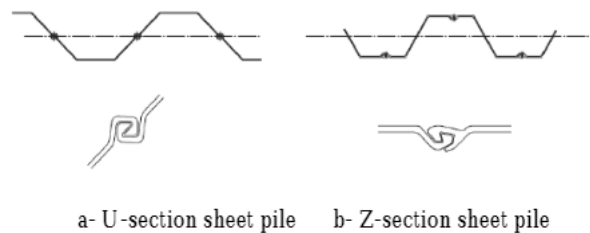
Sheet pile section types (Sadeghi et al., 2018)
